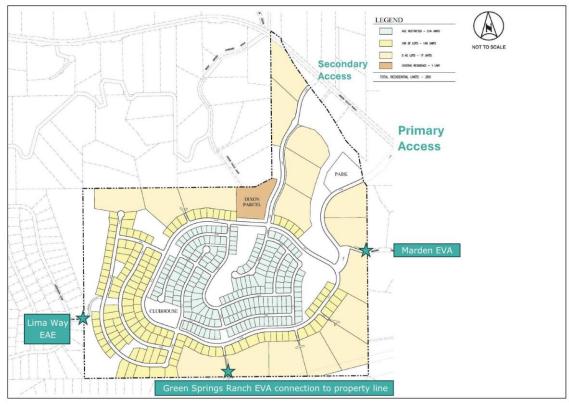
GENERATIONS DEVELOPMENT SITE PLAN
